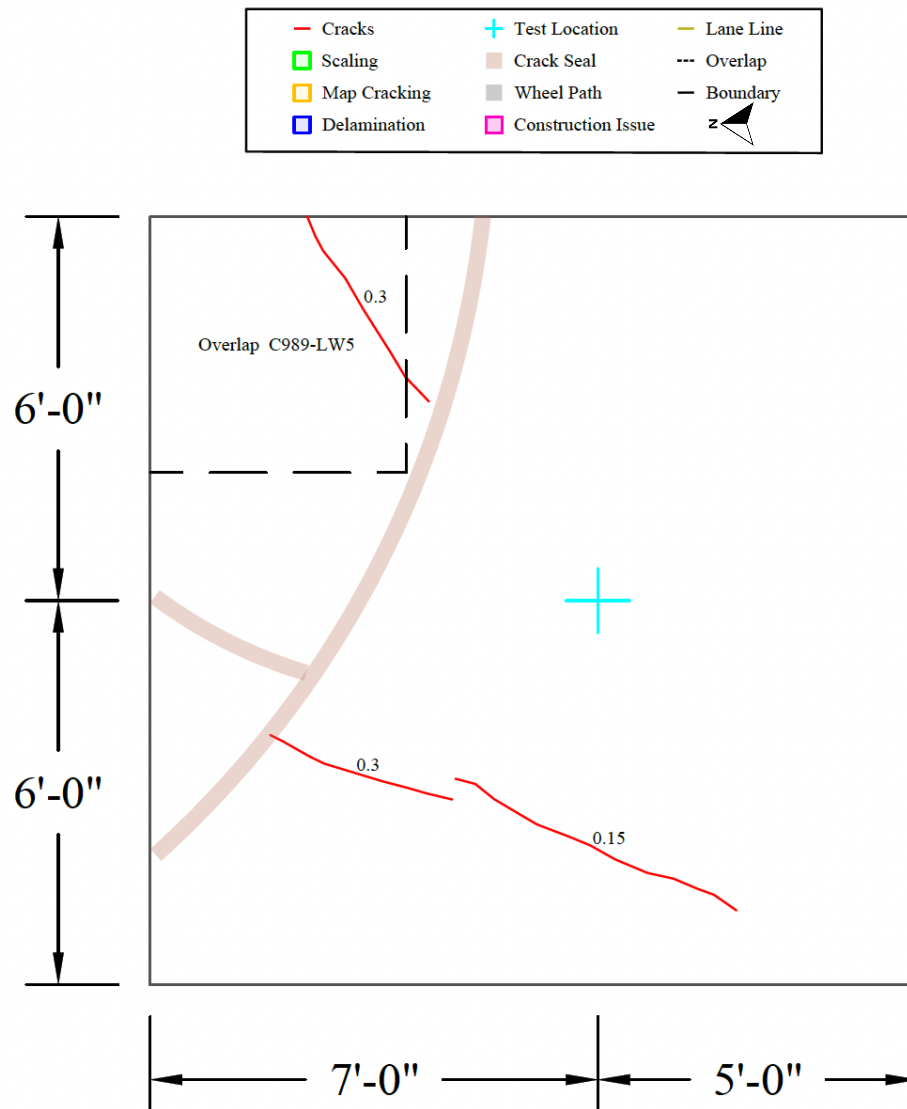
Test location 4 of lightweight concrete deck at bridge C-989.
